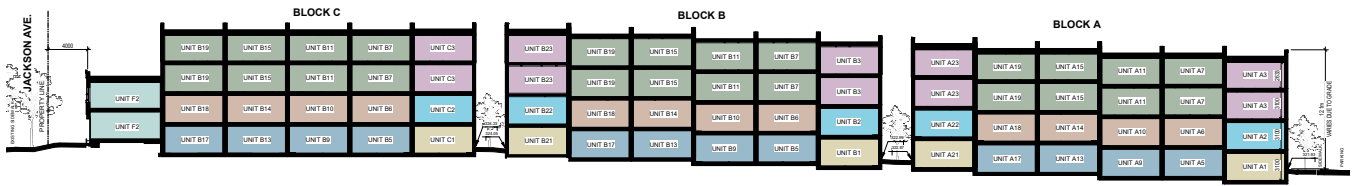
Stepped building form follows site grading (SRM Architects + Urban Designers, March 21, 2024)
